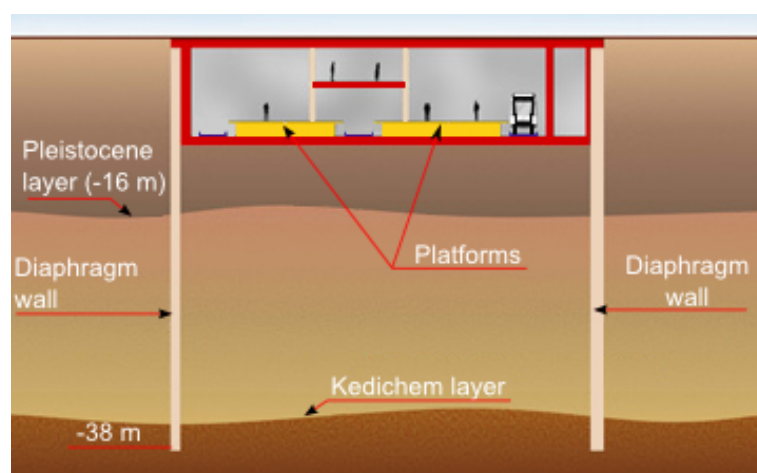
Schematic overview of the diaphragm walls and the layers in the subsurface. (Source: www.randstadrail.nl)
